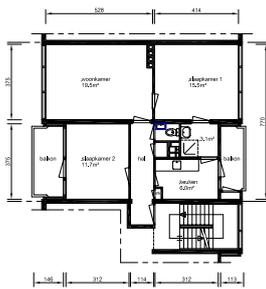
Floor plan of Intervam flats in Stanleylaan (Mitros, 2009)
